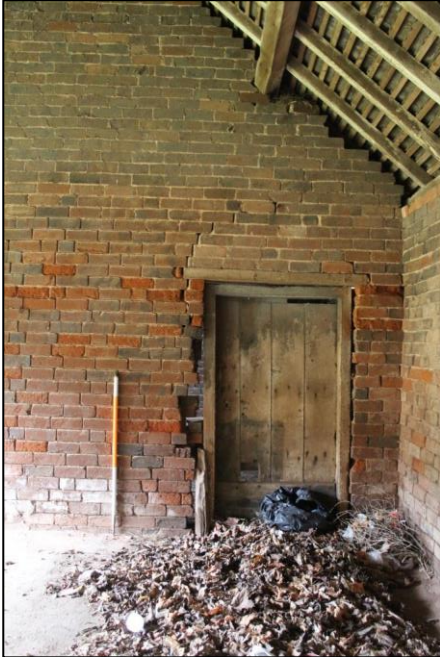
Door opening set within the western wall of Room 3, Building 5.
